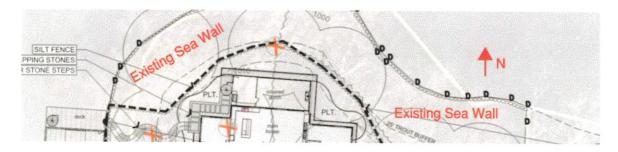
North Extent of Property/Sea Wall where 2-3 ft of riprap stabilization is needed
